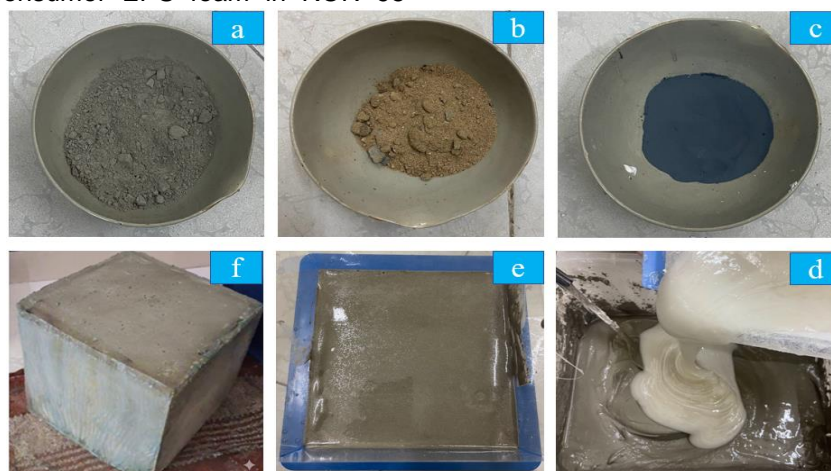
Fabrication of lightweight concrete: a- cement, b- sand, c- silica fume, d- mixing EPS solution into cement mortar, e- pouring concrete into the mold, f- concrete specimen after 28 days of curing
